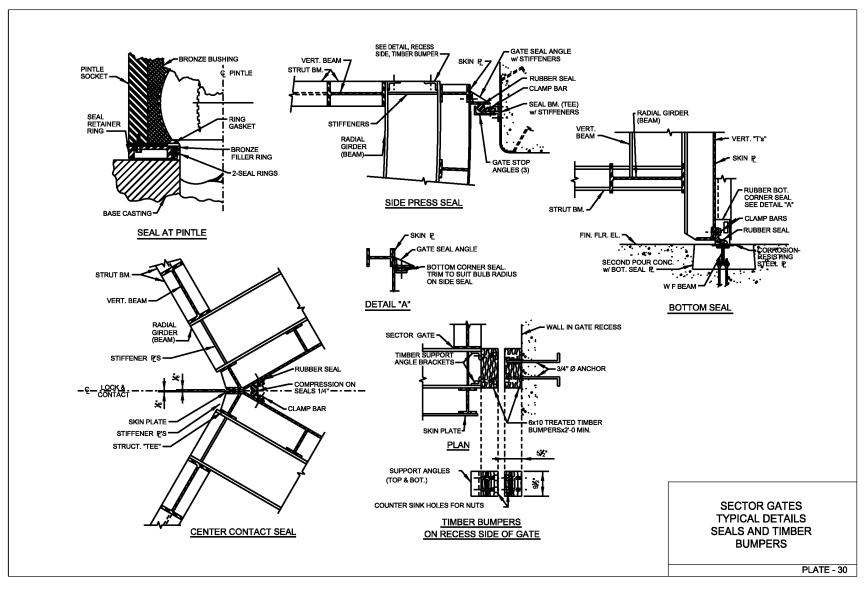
Plate 30: Sector gates, typical details, seals, and timber bumpers
